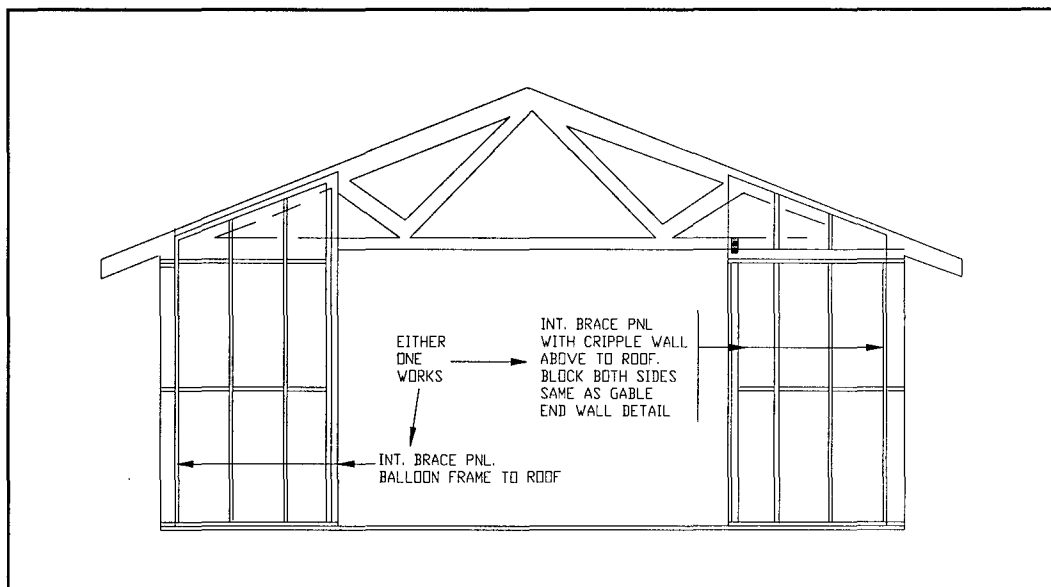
Wall parallel to truss alternate bracing detail.
